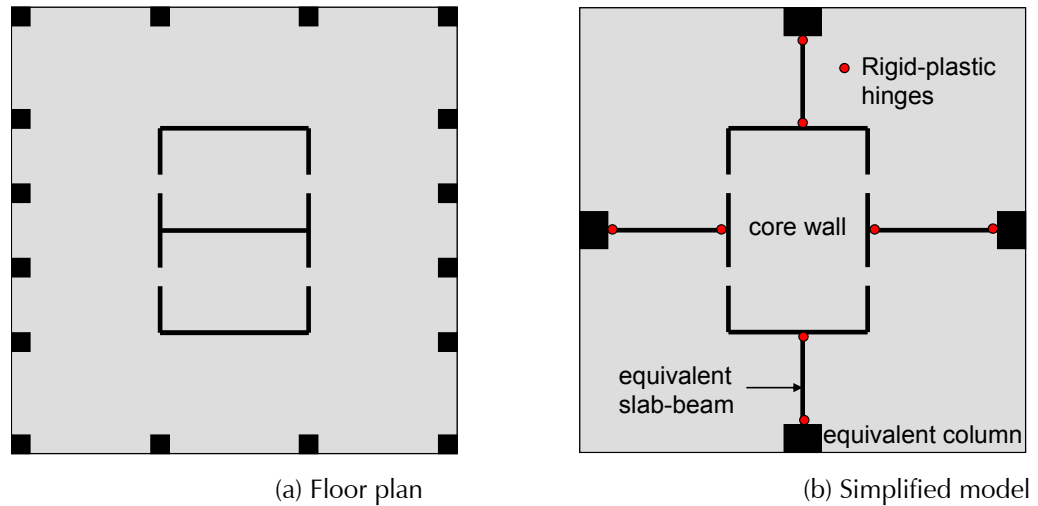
Floor plan and simplified model of the combined slab-column frame and core wall system.
